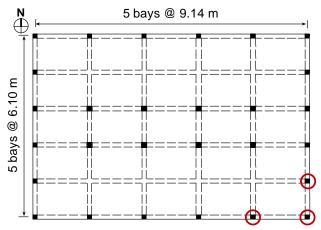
Plan layout of concrete IMF building. Circles indicate columns removed prior to pushdown.
